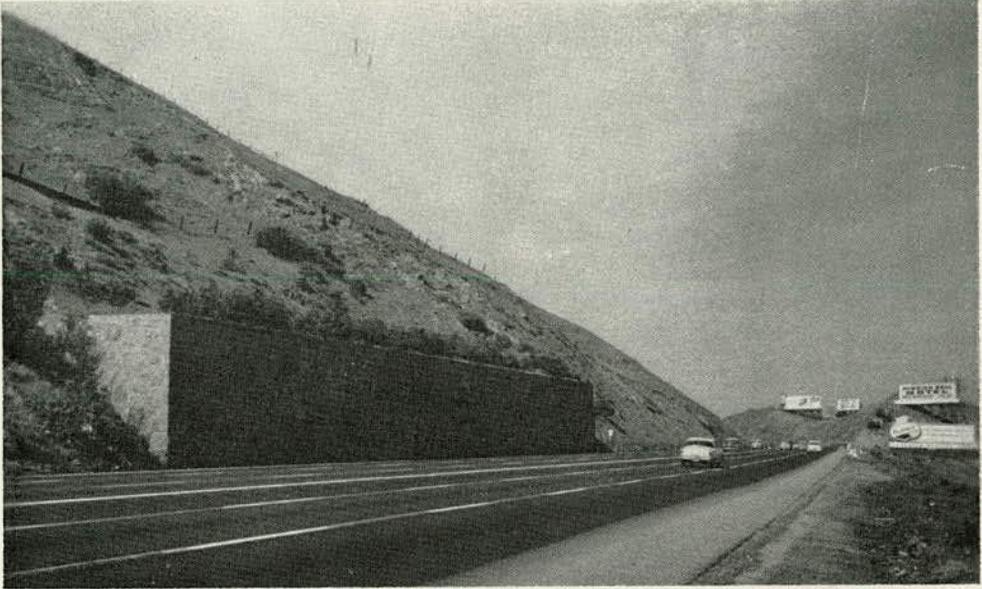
Rubble masonry retaining wall installed to prevent land movement in old landslide area near Brisbane, Calif. (Photograph by Bruce Utt, courtesy of California Division of Highways)
